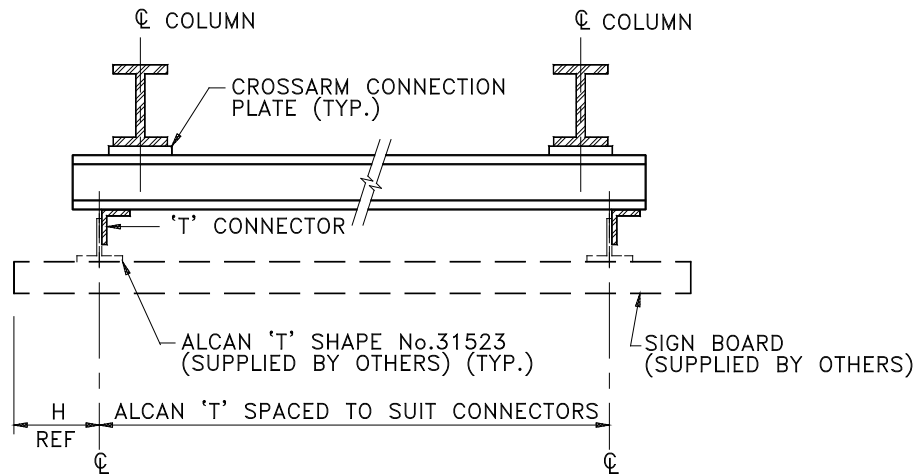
(c) INSTALLATION DETAILS
